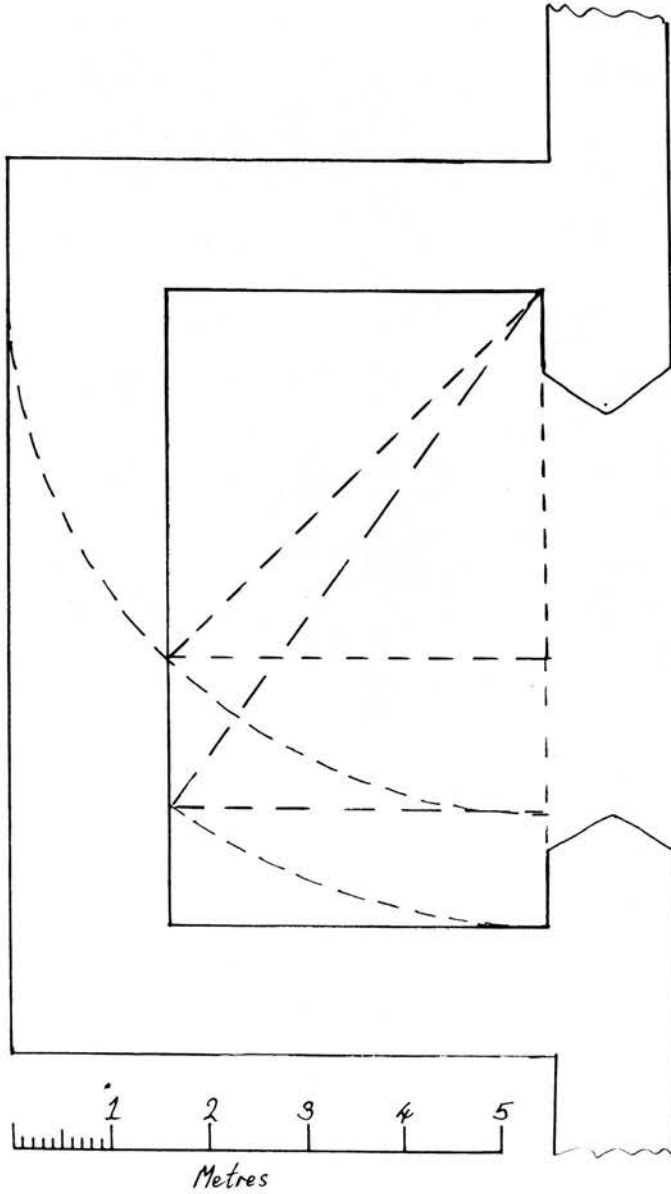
Church of the Holy Rude, Stirling: geometry of the tower plan
